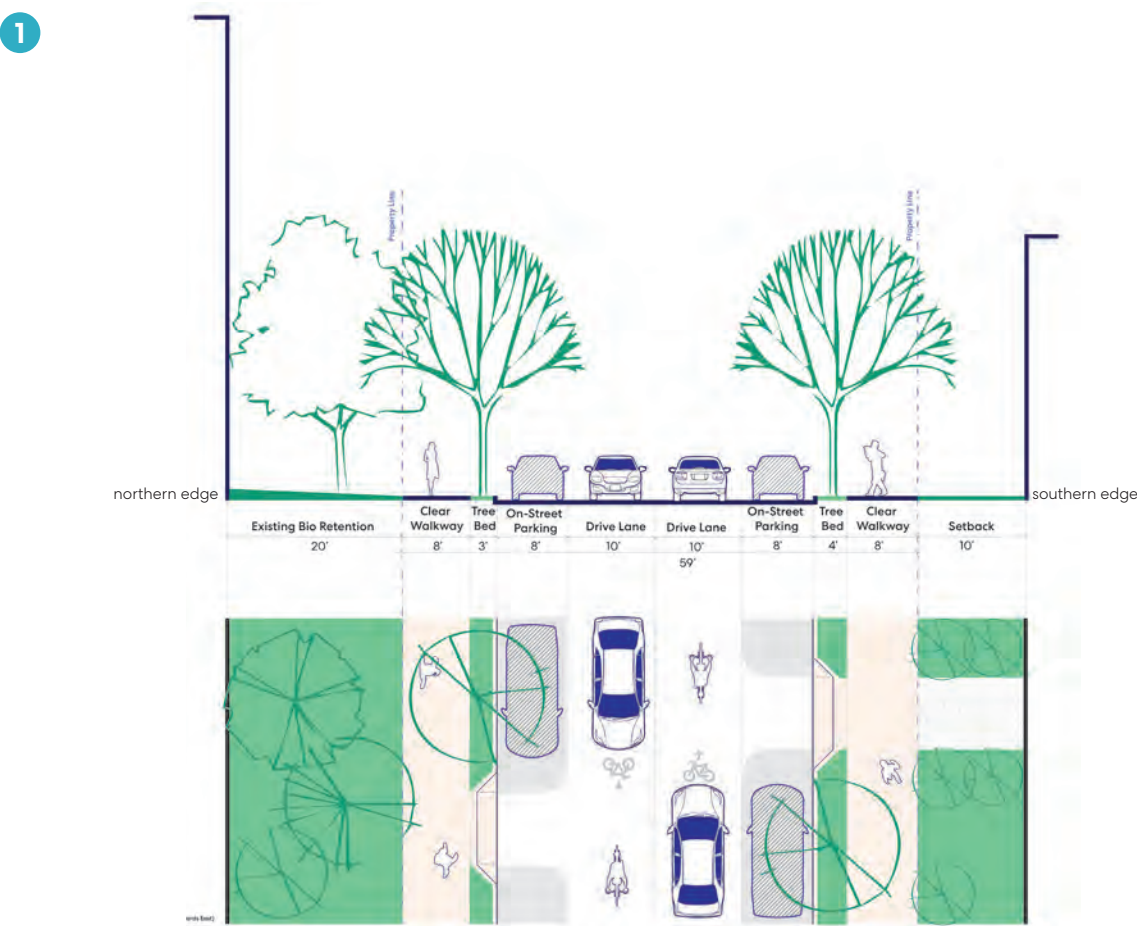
Typical Olive Avenue section between Park Boulevard and Ash Street
